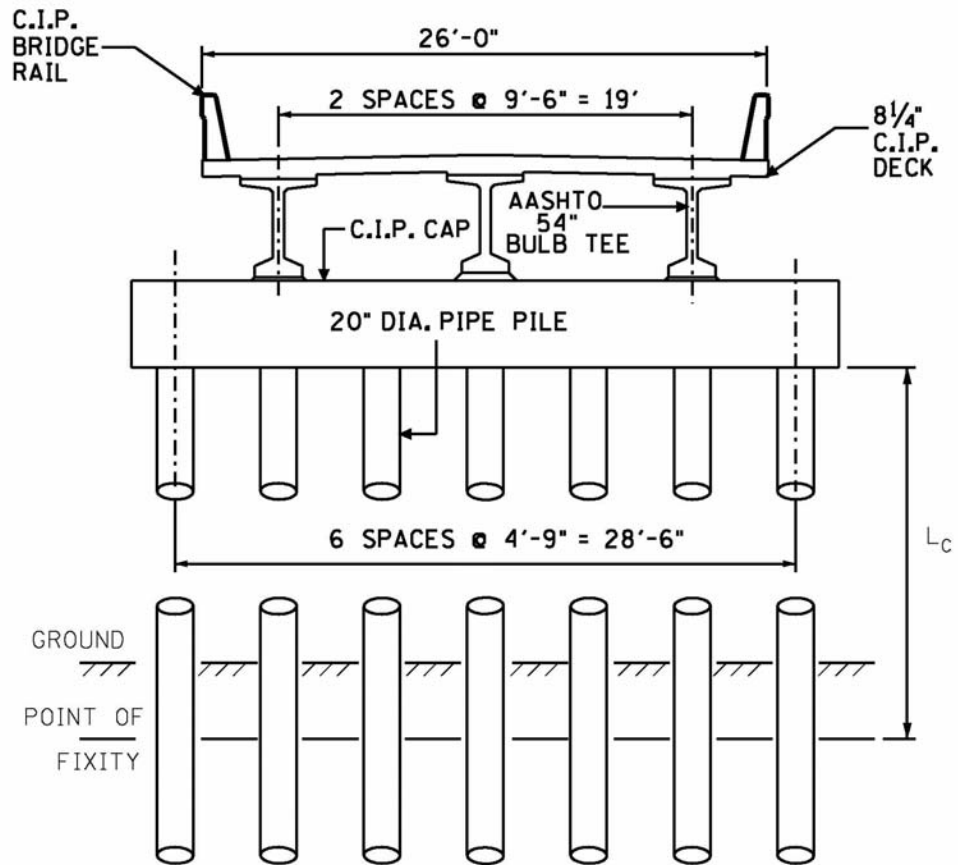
Cross-Section - Bridge Nos. 3 and 4
